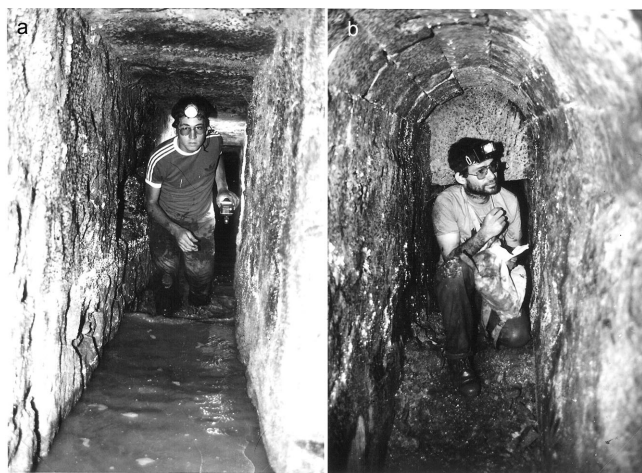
The main tunnel, built under the main street of Neapolis. Tunnel is ca. 70 cm wide. (a) Section covered with stone slabs. Photo: A. Frumkin. (b) Section with barrel-vaulted roof. Photo: Ofer Lavi
